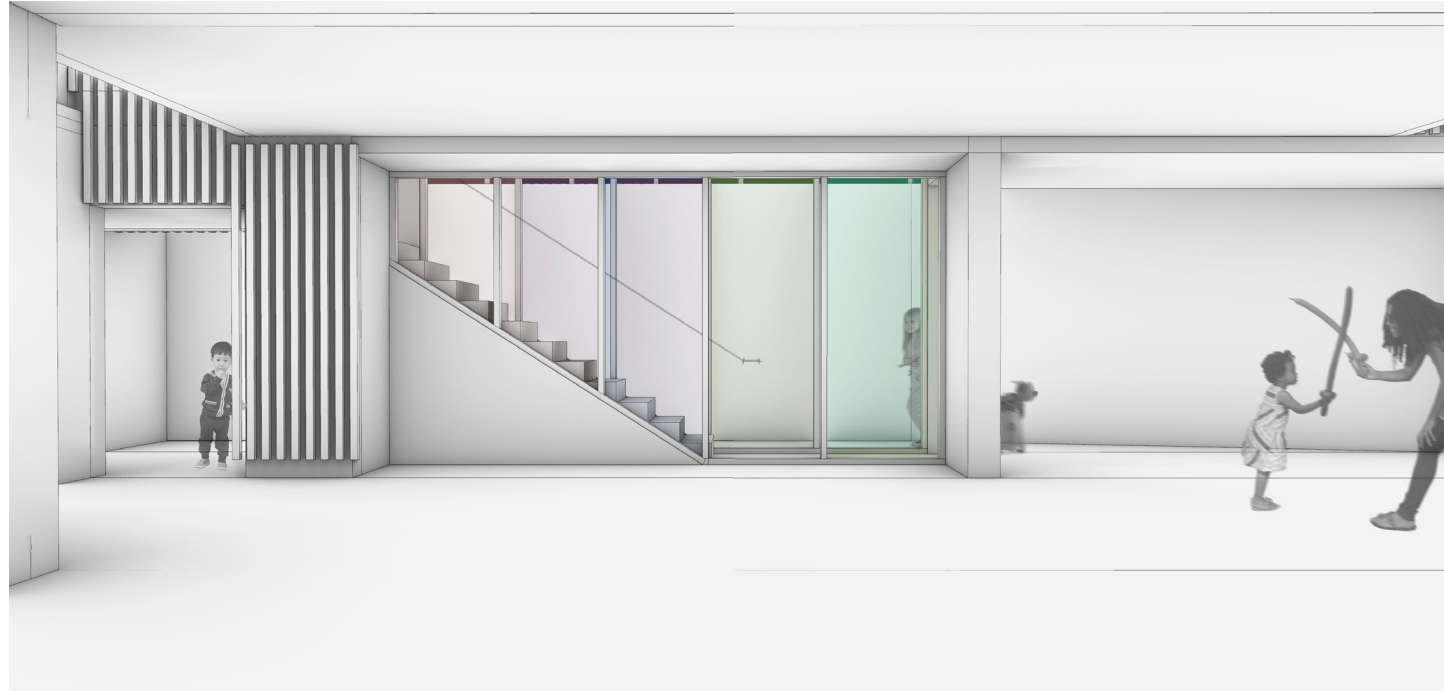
Open lower level with connection to the exterior via lightwells and a diagonal retaining wall along Draper Road
